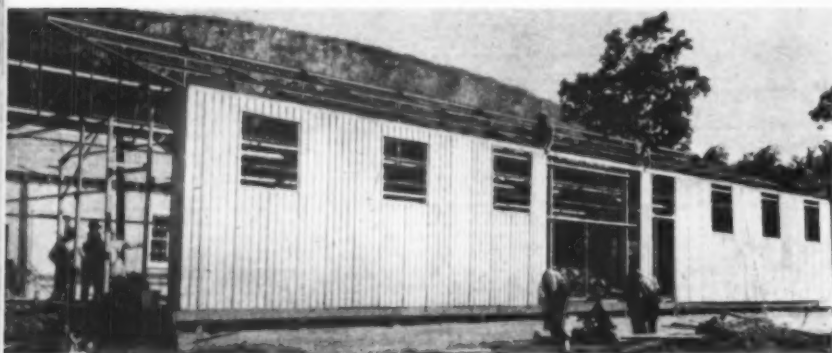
9 A.M., SECOND DAY—Wall panels on one side of building are placed by two teams working toward center from opposite ends of building.
